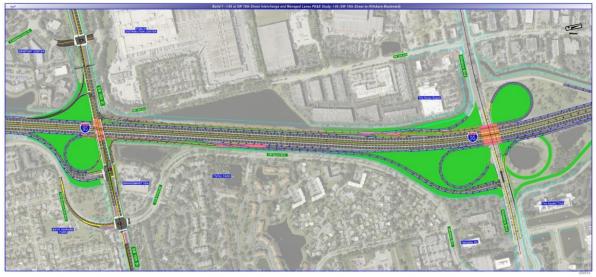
1: I-95 Alternative 1 (SW 10th Street to Hillsboro Boulevard)
